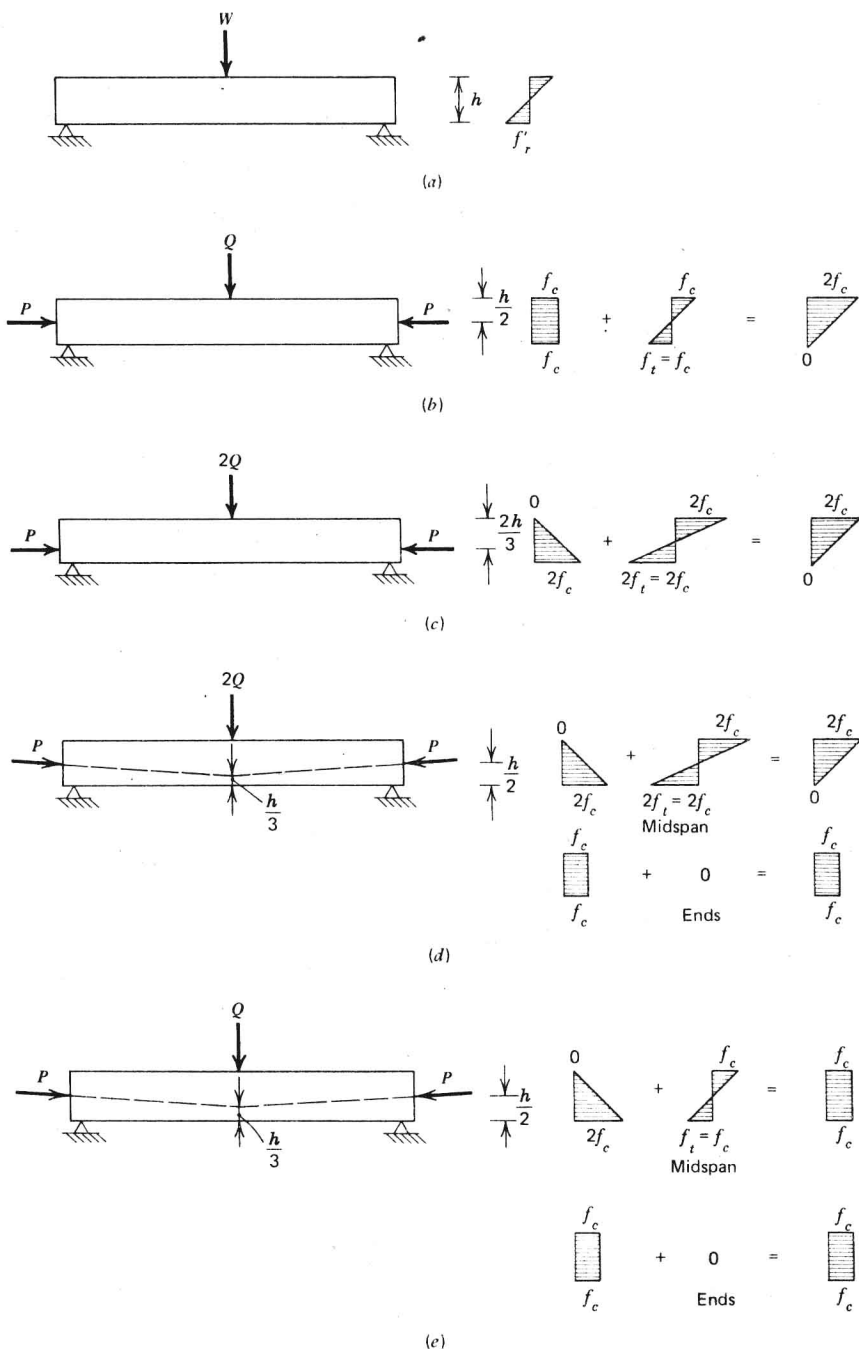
Alternative schemes for prestressing a rectangular concrete beam. (a) Plain concrete beam. (b) Axially prestressed beam. (c) Eccentrically prestressed beam. (d) Beam prestressed with variable eccentricity. (e) Balanced load stage for beam with variable eccentricity.
